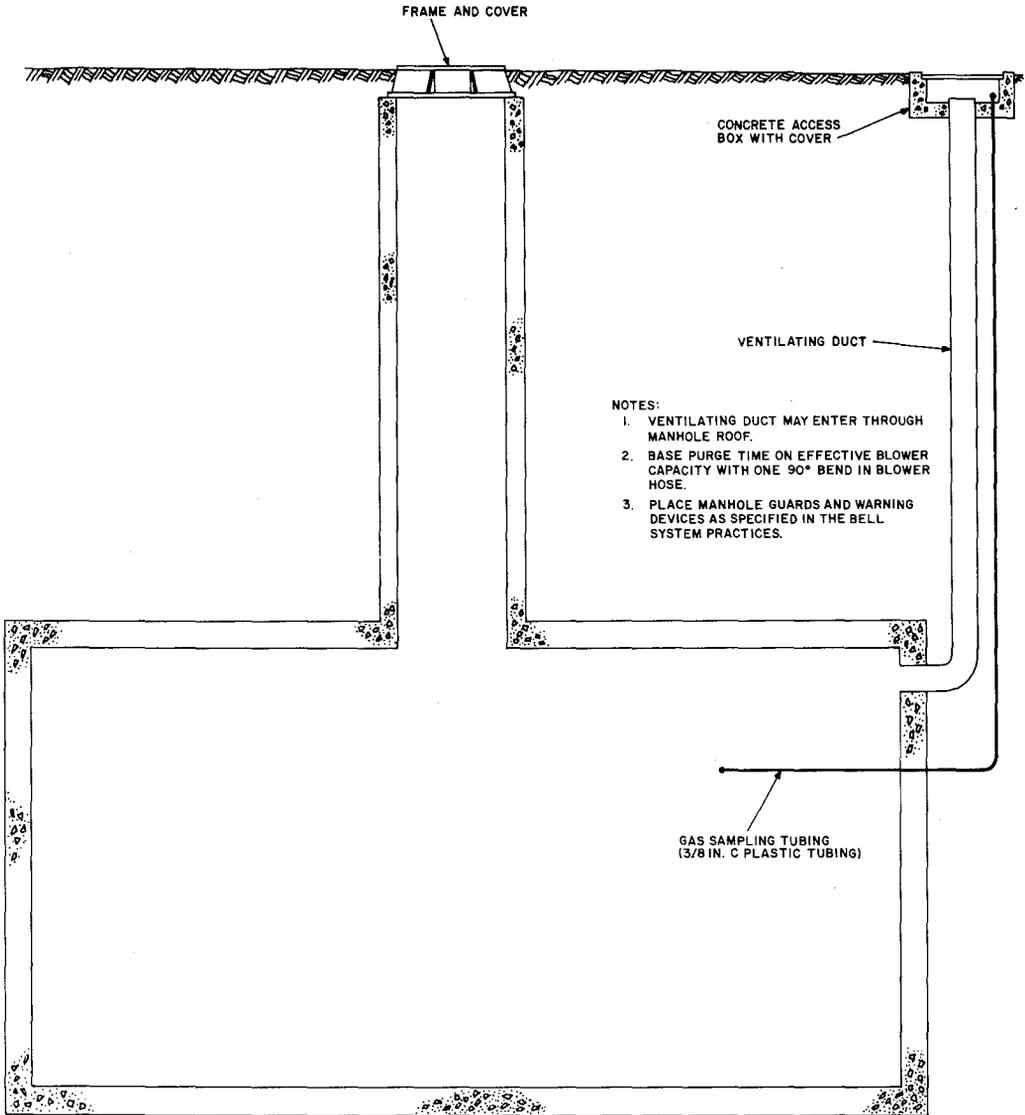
Deep Neck Manhole With Permanent Ventilating Duct Installed Adjacent to Manhole
